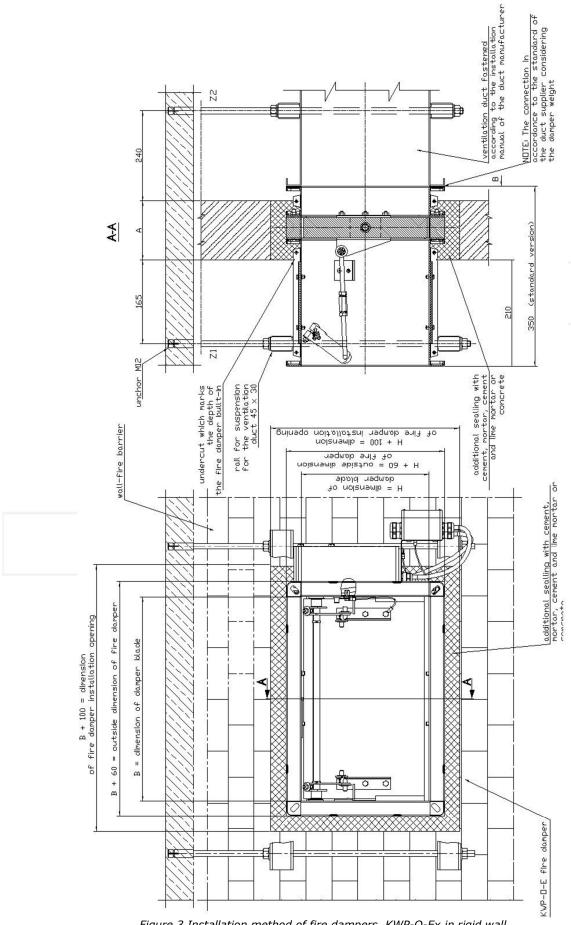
Installation method of fire dampers KWP-O-Ex in rigid wall
